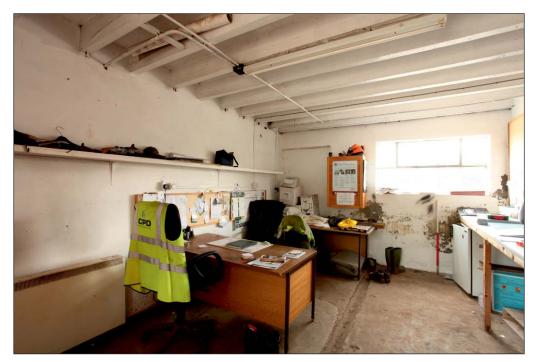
View of office G25 in the west wing, Building 1. Note the blocked door and drainage channel
